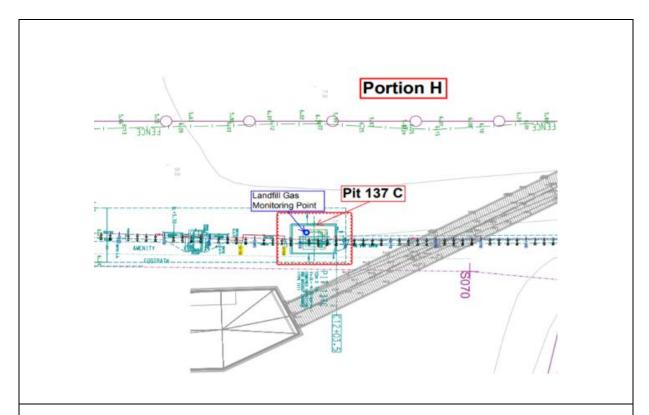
Monitoring Location - Pit 137C (137 Pit C)
